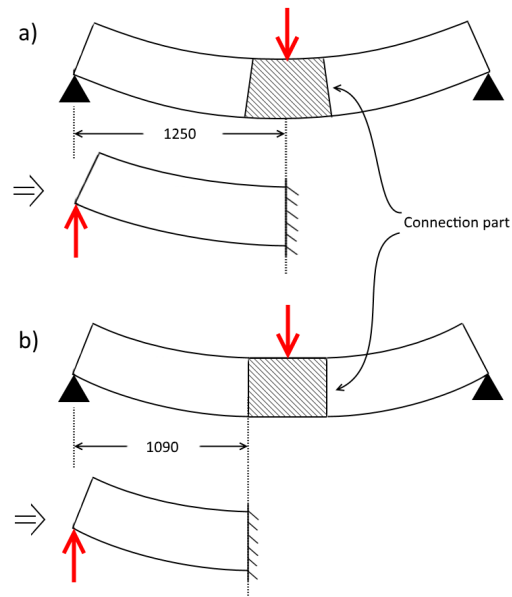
Simply supported beam redefined as a cantilevered beam: (a) with connection assumed to bend with the beam; (b) with connection assumed to provide extra stiffness (remain straight).
